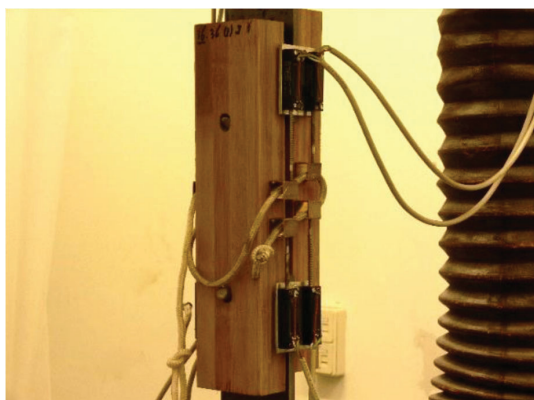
Bamboo joint with centre steel plate in the test set-up.
